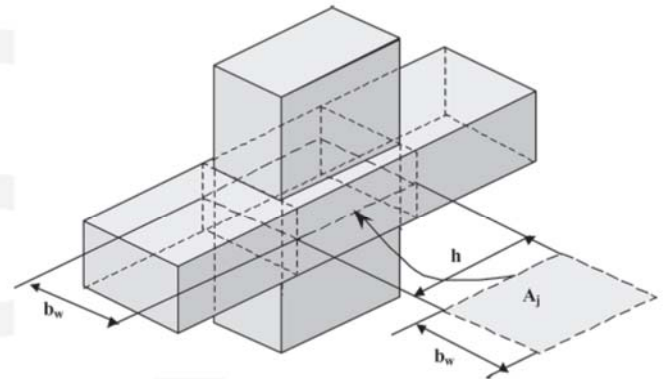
Definition of A_j for girder wider than column.
